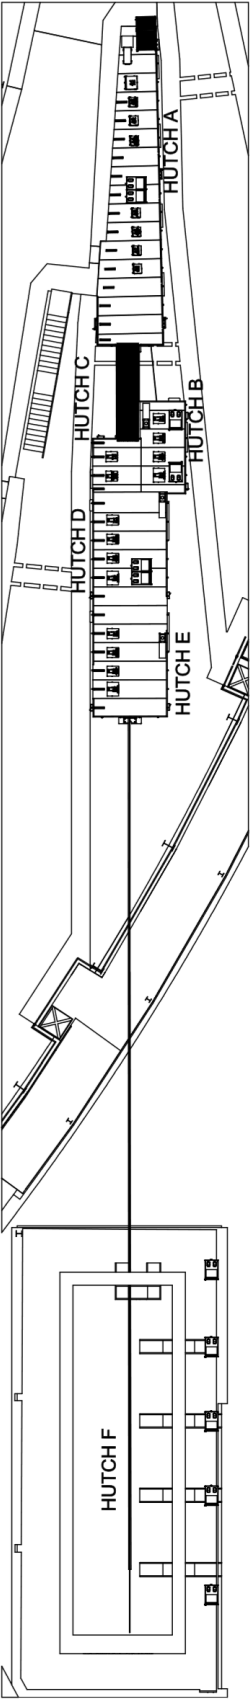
Layout showing the utilities passing through the SR tunnel wall
